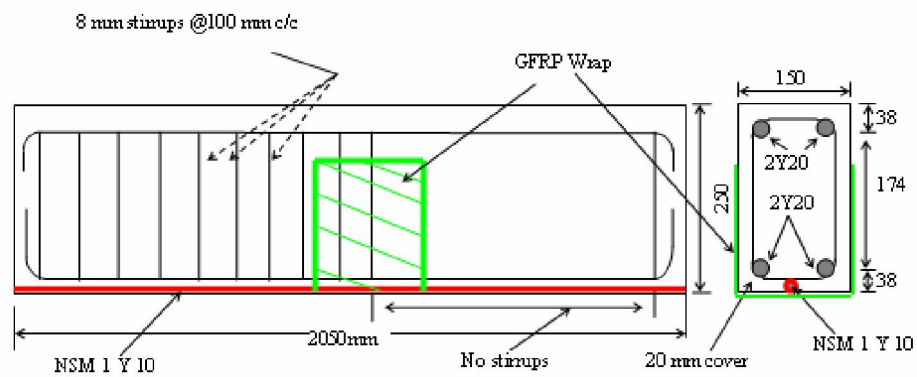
Arrangement of NSM rod and GFRP Wrap in retrofitted beam(S)
